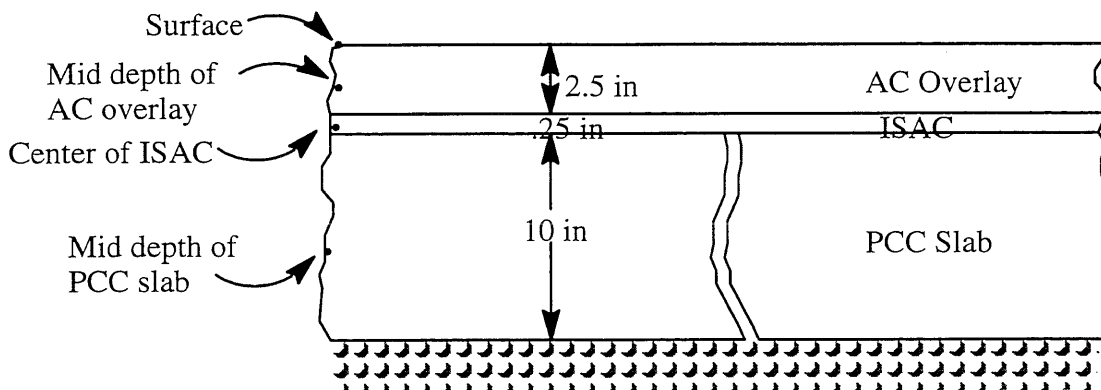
Pavement Cross Section Used For Thermal Evaluation
